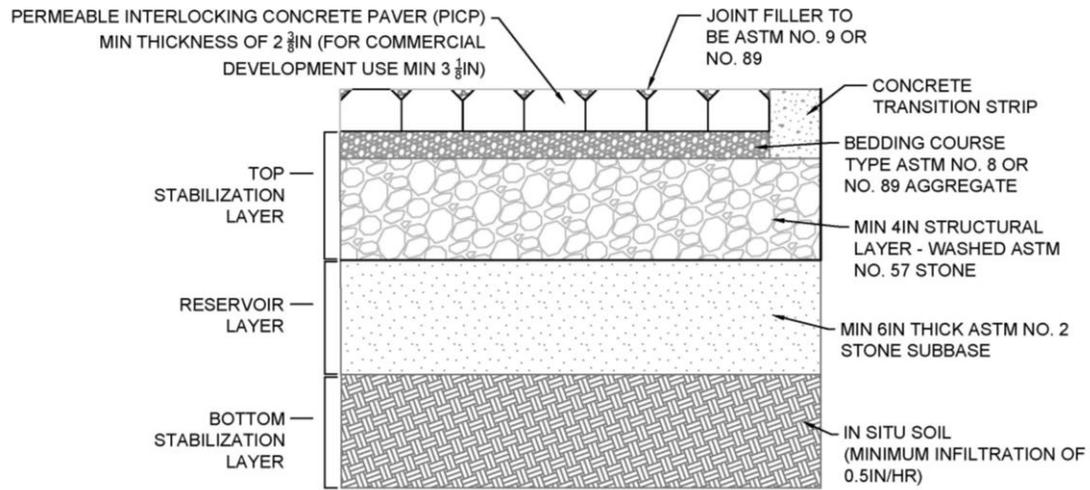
POROUS PAVEMENT PAVER TYPICAL SECTION
